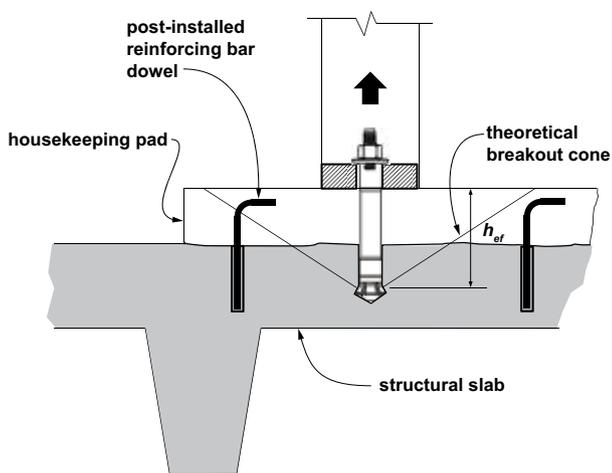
Undercut anchor in a housekeeping pad anchor with substantial engagement (at least three anchor diameters) into the slab below. Here, post-installed dowels are used to anchor the pad to the structural slab
